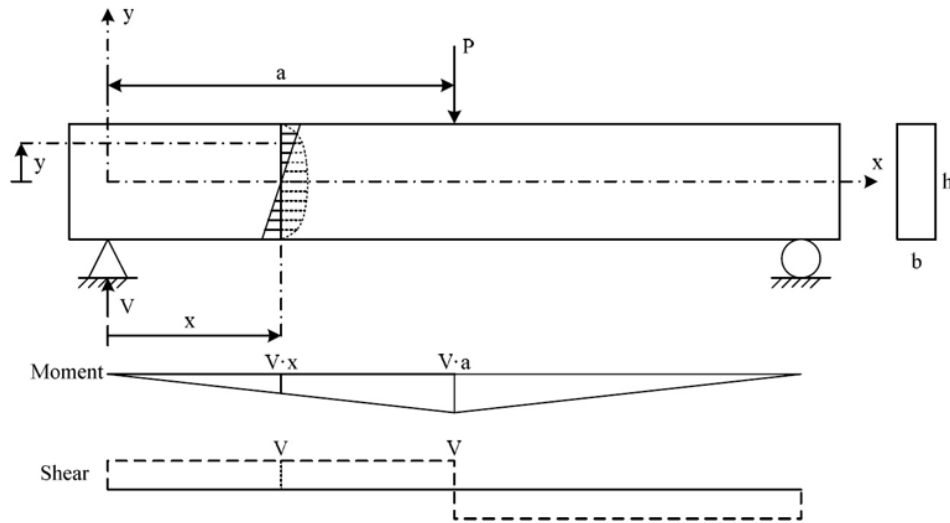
Plain concrete beam subjected to three point loading [44].
